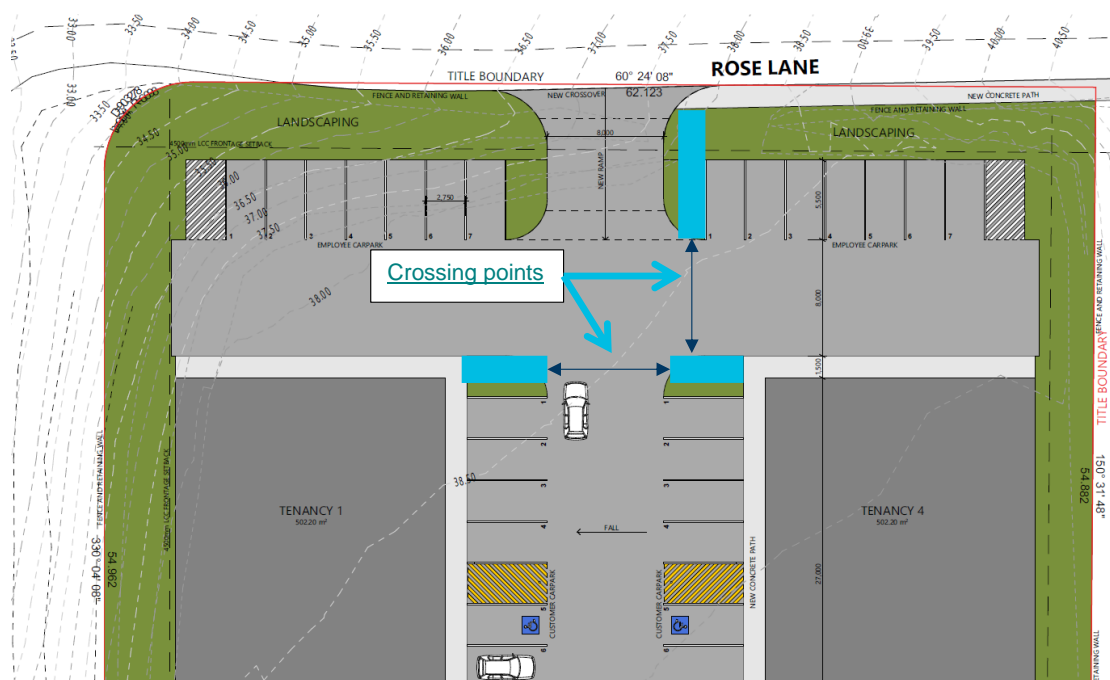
Recommended footpath extension and crossing points adjacent to main site access
